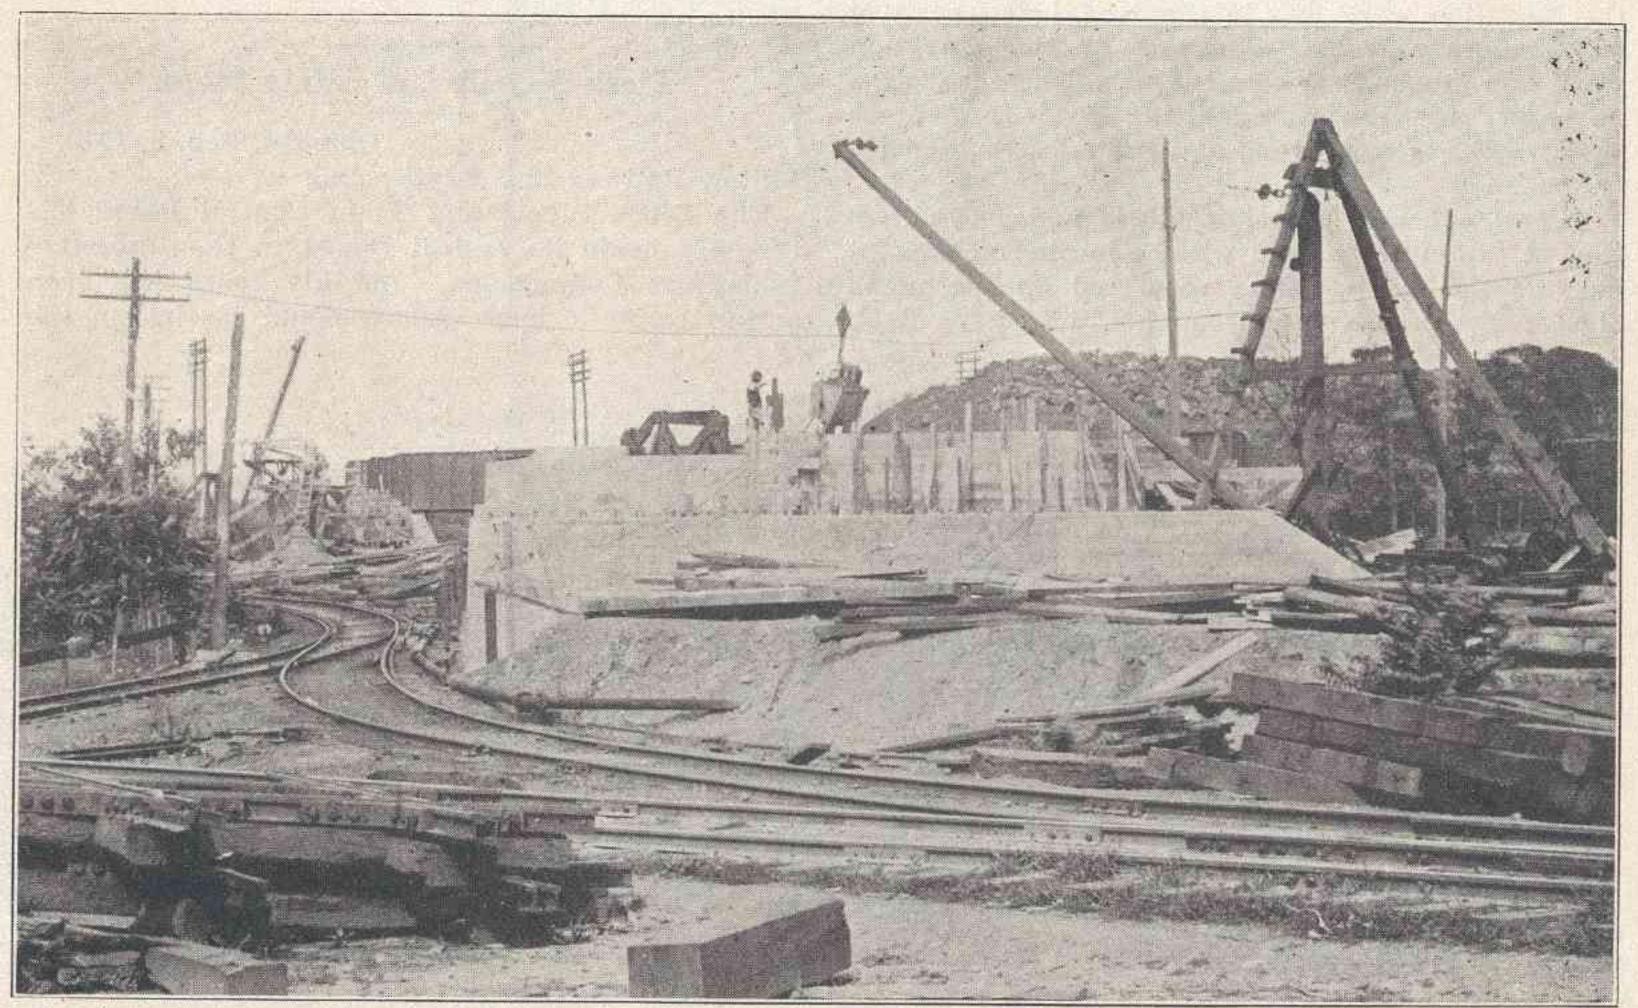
Looking around the Y-Track, Abutments under Construction.
